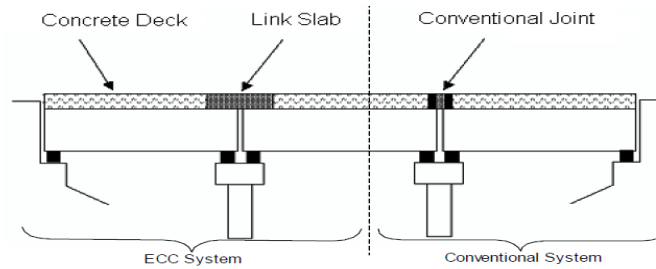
Bridge decks with a) ECC link slab and b) conventional mechanical steel expansion joint (Kendall et al., 2005)
